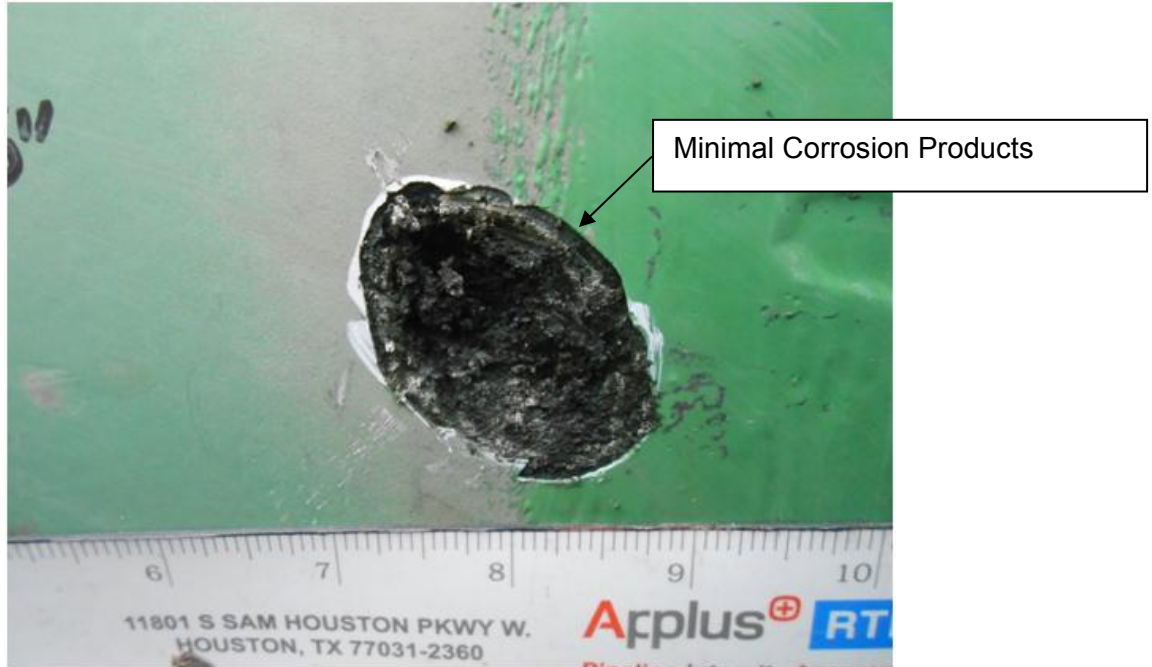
MP 995.95 –External Corrosion Pitting
